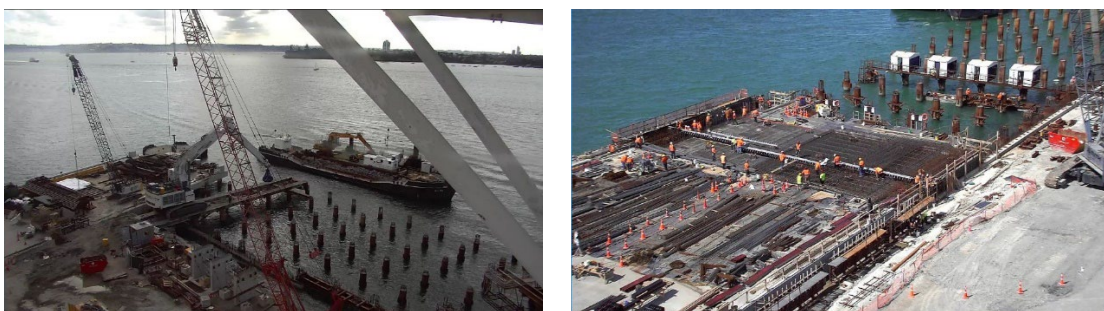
Top: West end of Fergusson North berth construction at early stages. Bottom: Wharf deck construction looking east (Source POAL, 2016-2017).
